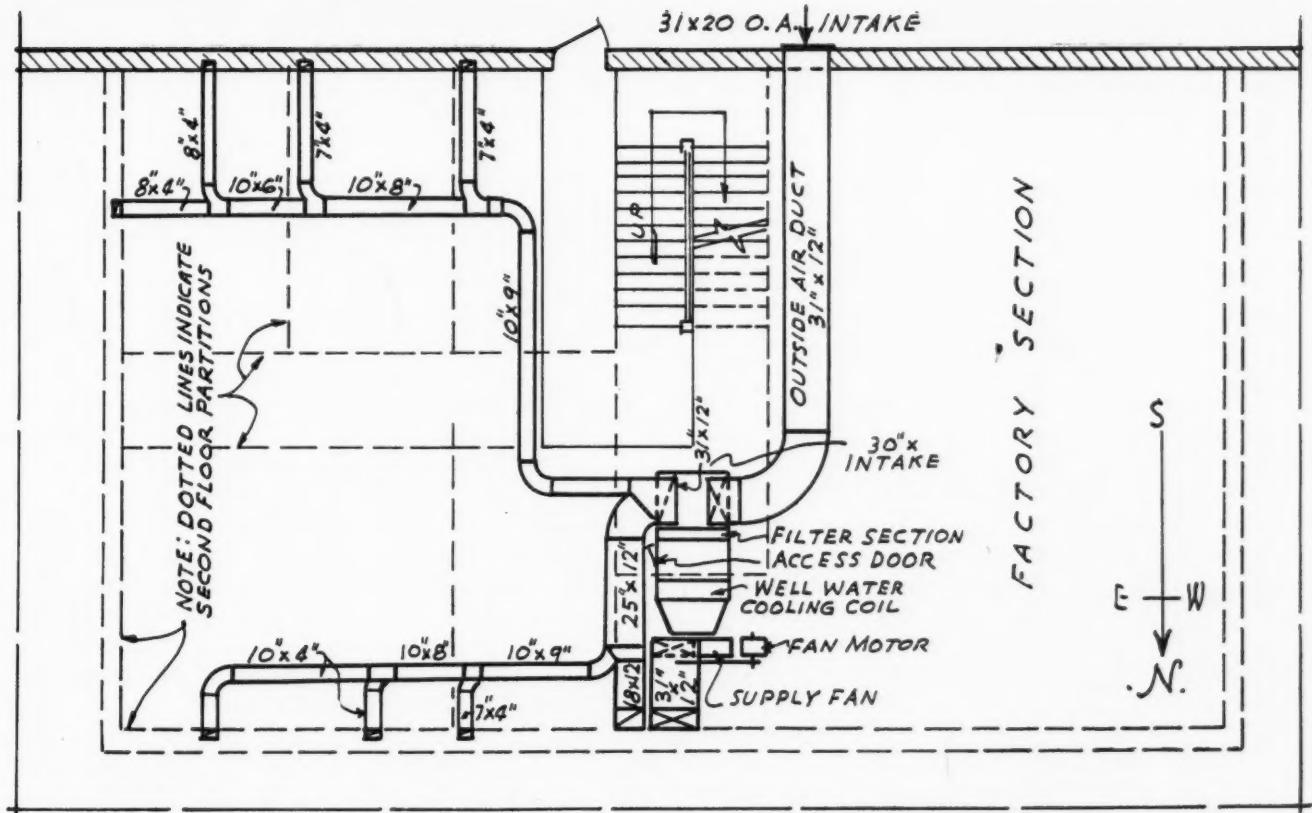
SECOND FLOOR PLAN SHOWING OFFICE PARTITIONS AND DUCT WORK.
